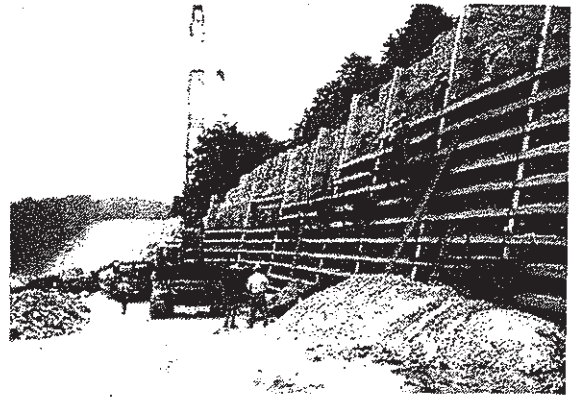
System of vertical and horizontal concrete parts for lining wall.
